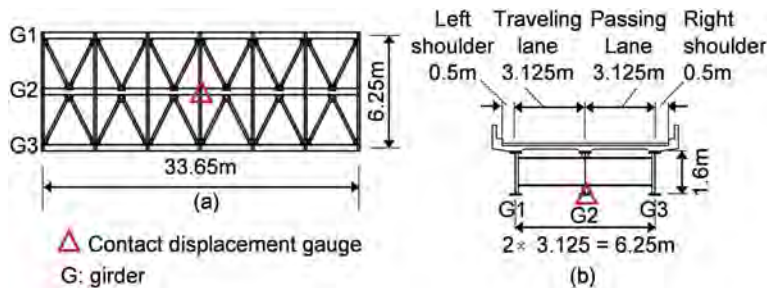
Schematic diagrams of the test bridge with sensor layout: (a) Plan view; (b) Sectional view.
